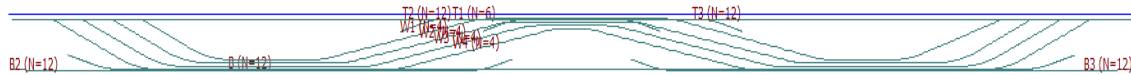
Schematic diagram of main bridge box girder longitudinal prestressed steel beam layout
